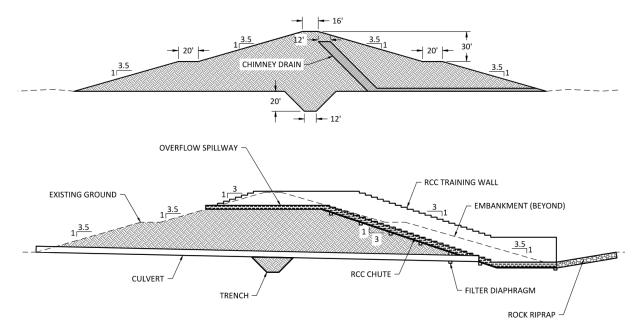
Typical Dam Embankment and Principal Spillway Sections
